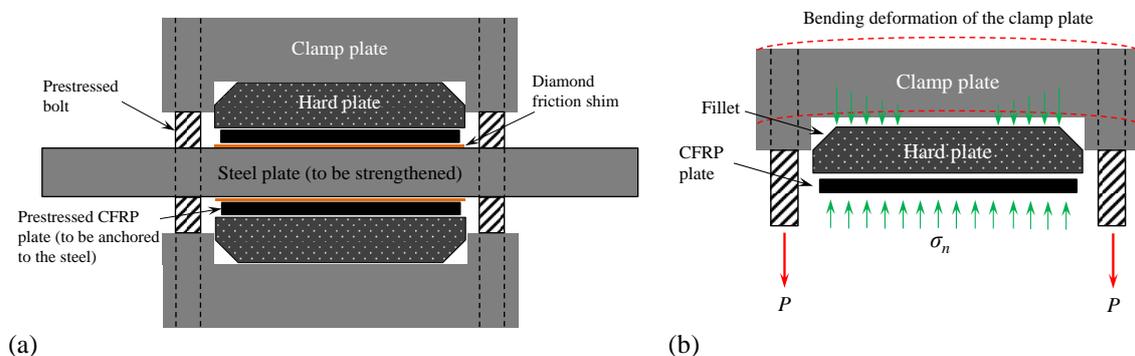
Schematic view of the mechanical clamping system: (a) cross-sectional view; (b) stress transfer between different parts.
